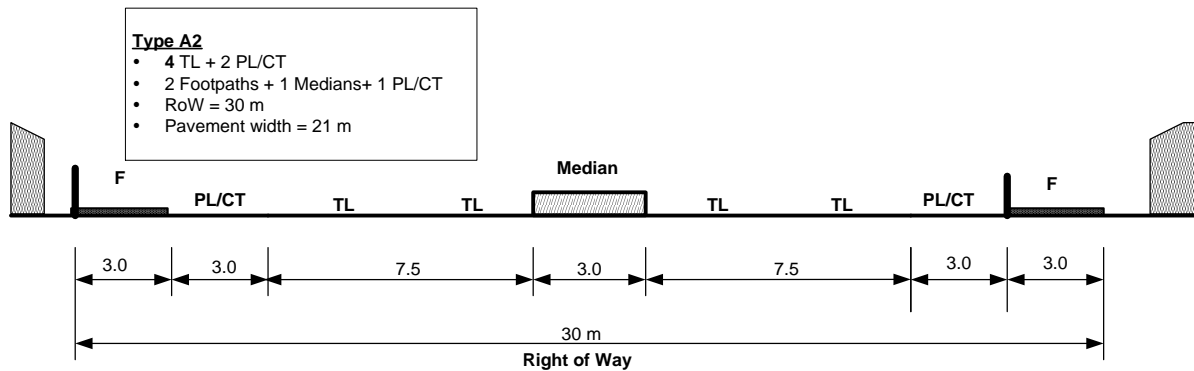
Typical cross section of Sub-arterial (Feeder Roads)
